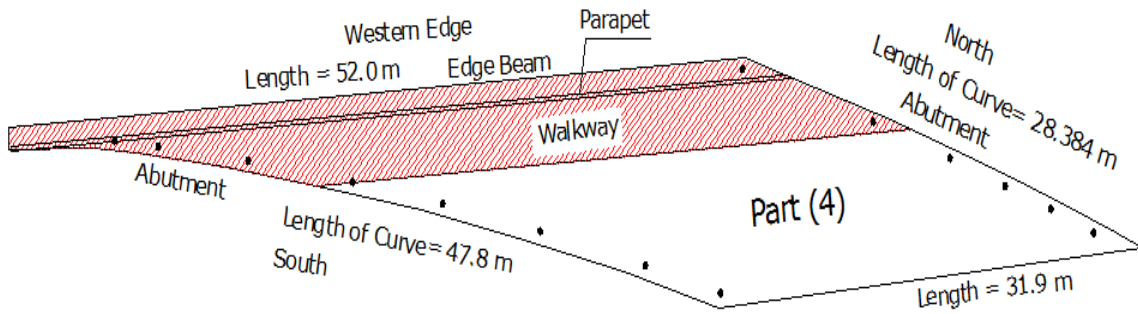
Plan showing the dimensions, curvatures and walkway of the Part 4 of the bridge.
